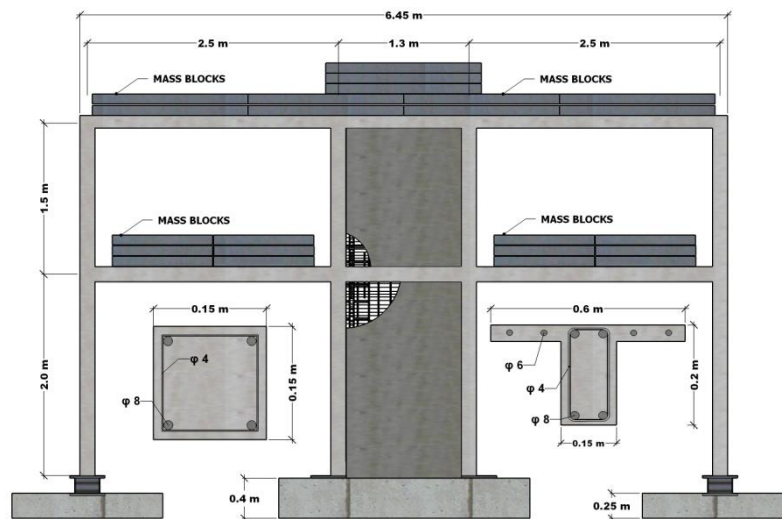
Reinforced Concrete Infill Wall Retrofitted Specimen
